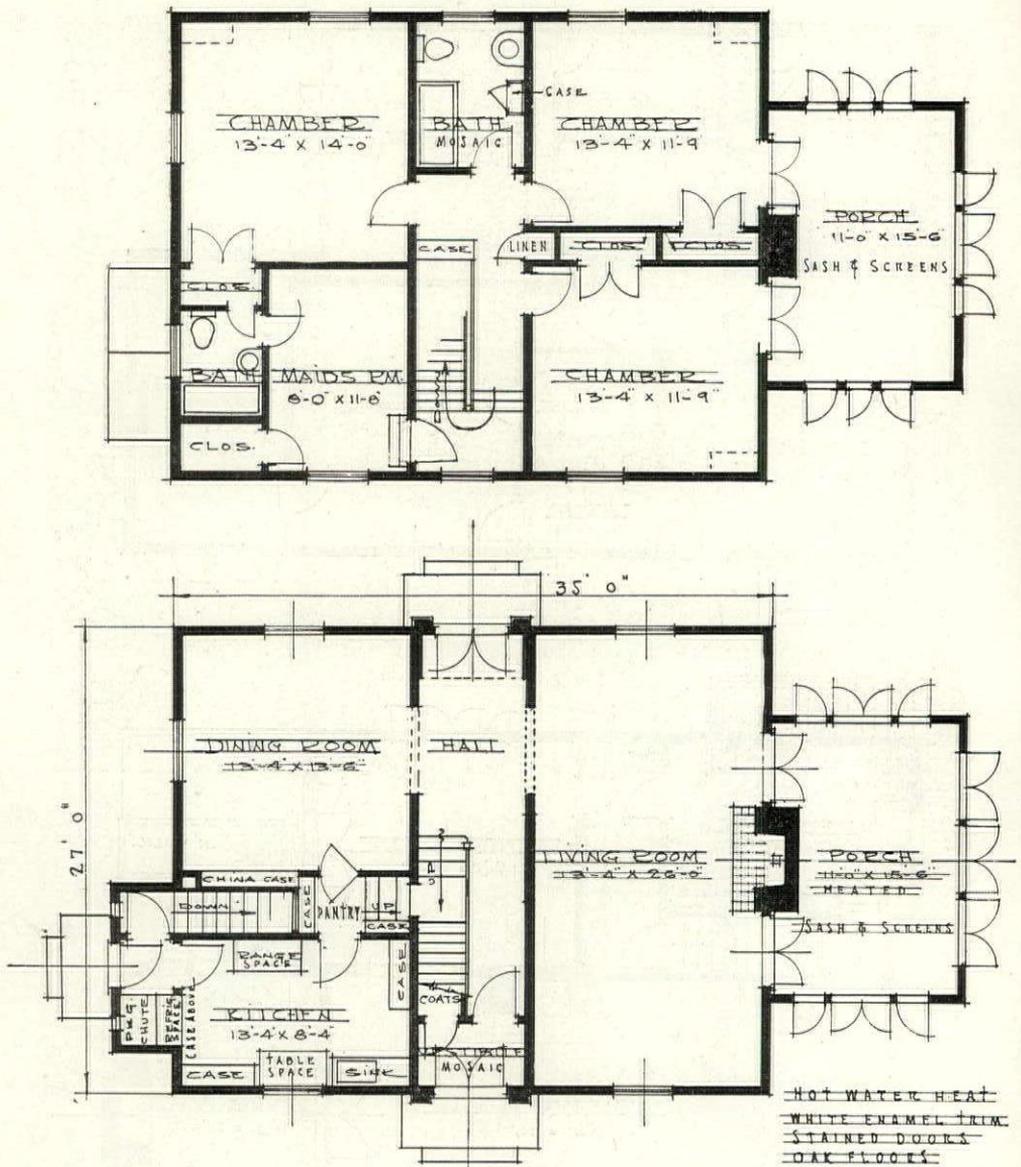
FIRST AND SECOND FLOOR PLANS—HOUSE OF F. E. PAYNE, GLENCOE, ILL. J. A. ARMSTRONG, ARCHITECT.
